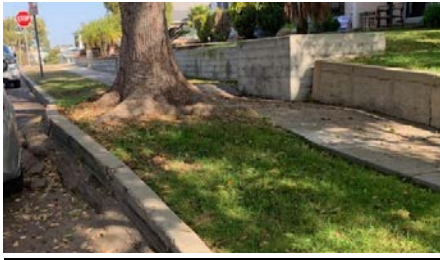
536/540 Arena Street damaged asphalt, curb, and sidewalk due to tree roots.
